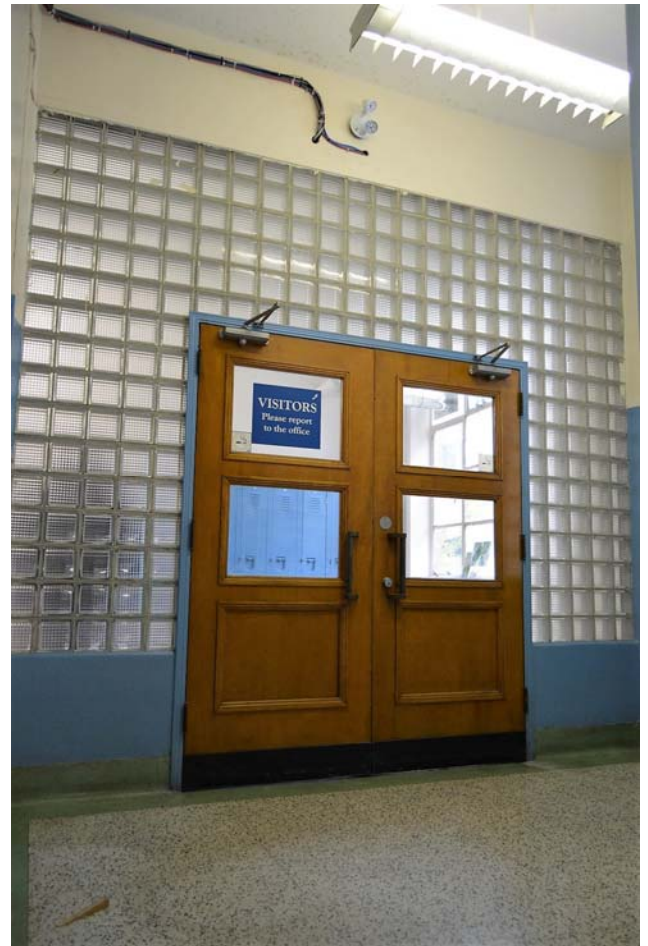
Ground-floor entrance wall of glass blocks centred by double wood-and-glazed doors
